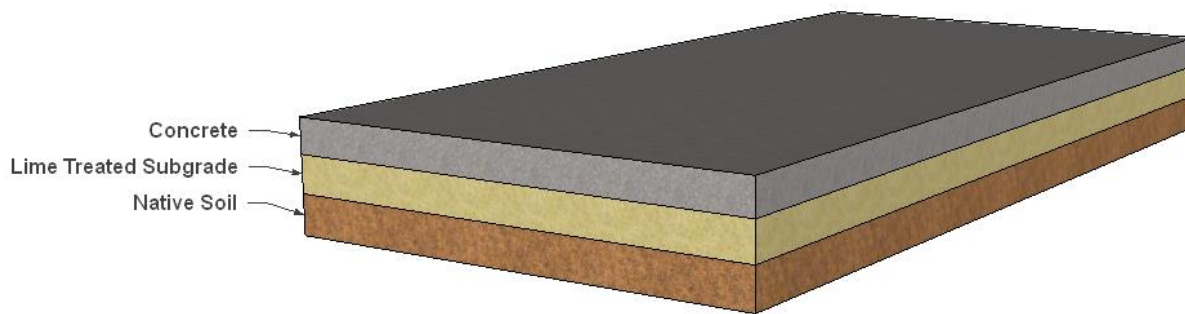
Option 1 Rigid Pavement Typical Section
